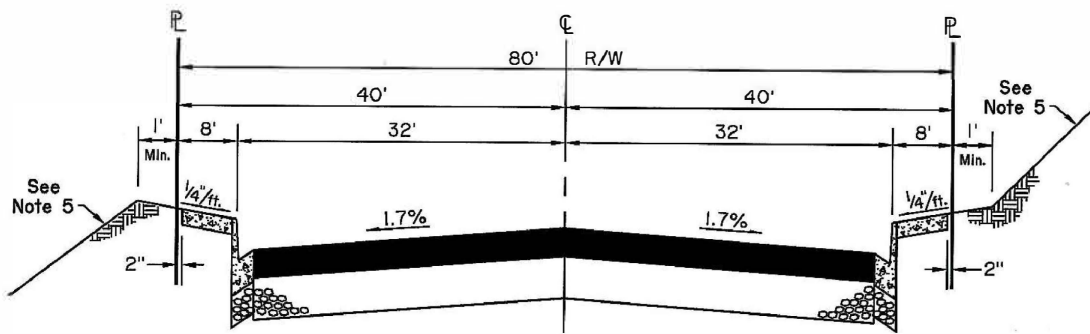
CITY OF FULLERTON GENERAL PLAN ROADWAY CROSS-SECTION
